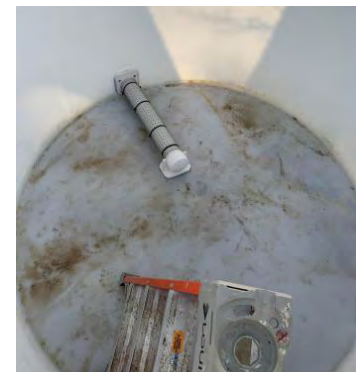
PVC outlet pipe with 0.375-inch holes and mesh covering
